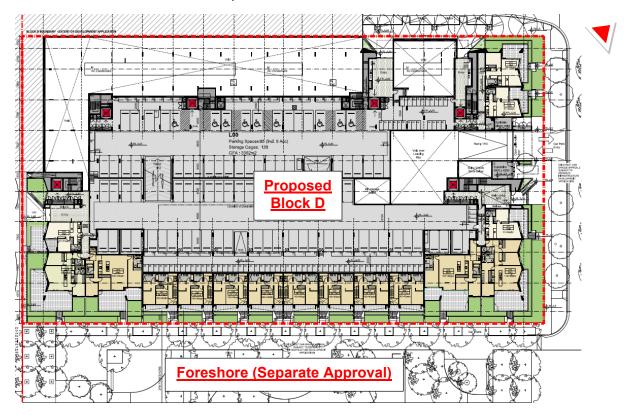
Proposed Architectural Layout (Courtesy of Batessmart)
